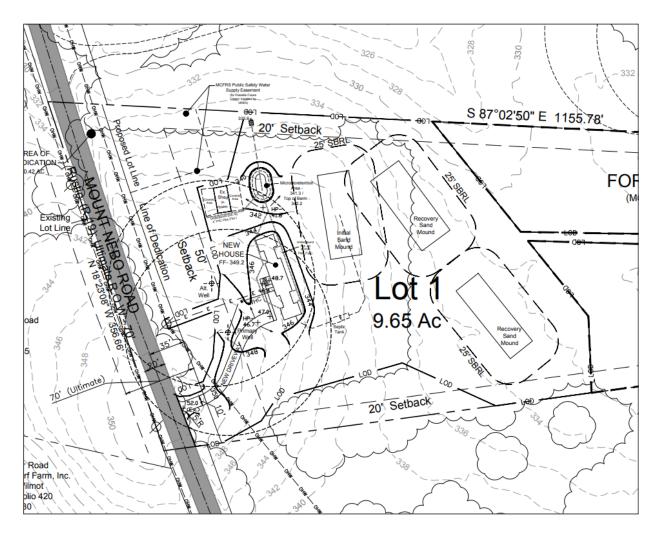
Administrative Subdivision Plan - Proposed House Location
